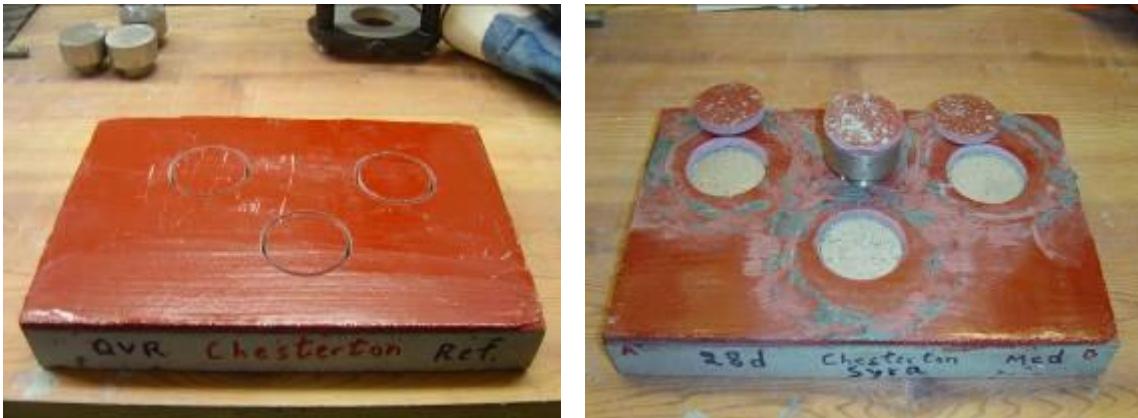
Test slabs with system 4G at pull-off testing, without exposure (left hand picture) and after exposure (right hand picture).
